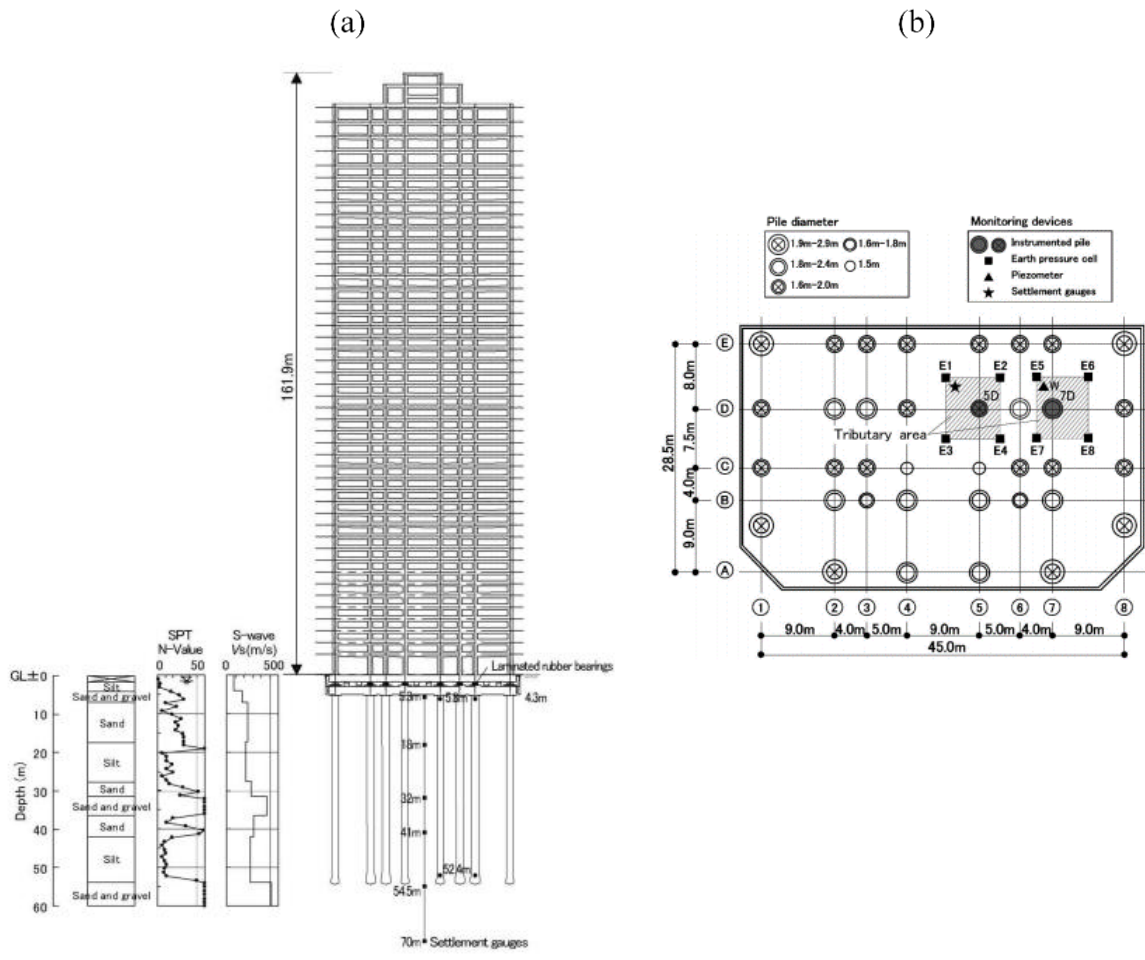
Detail view of the building (a) Schematic view with soil profile (b) Pile arrangement (Yamashita et al. 2011)
